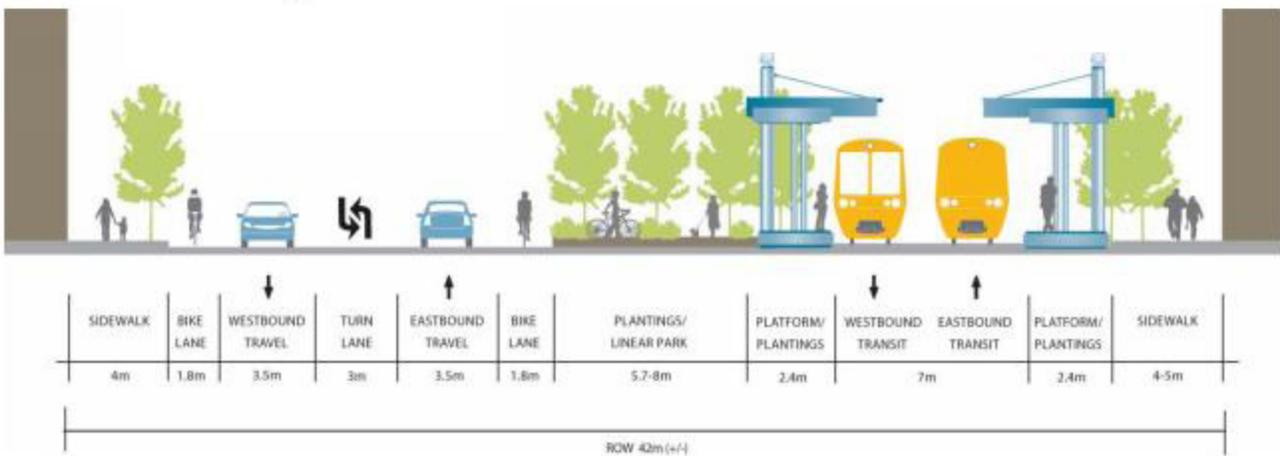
Alternative Cross Section for Villiers Street Identified in the 2010 LDL EAMP
